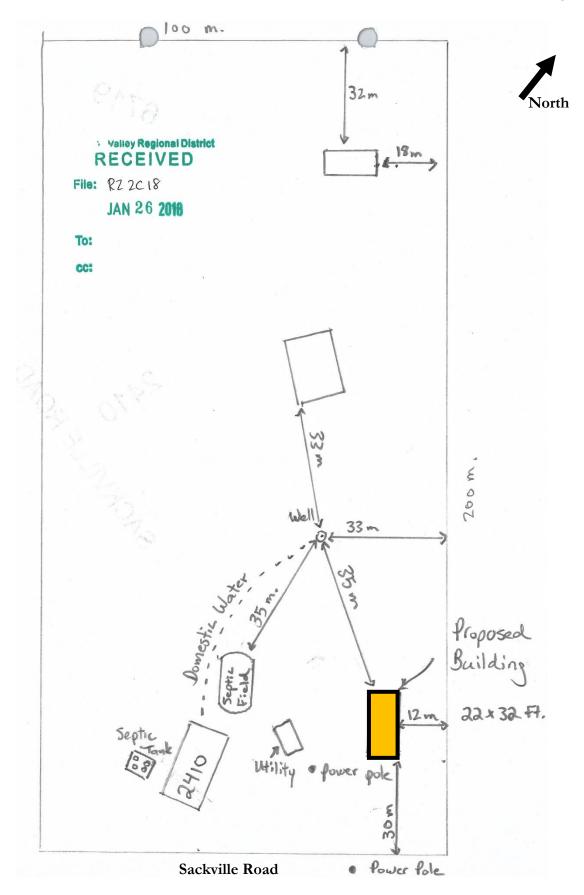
Proposed Site Plan if Rezoning were to be Successful
